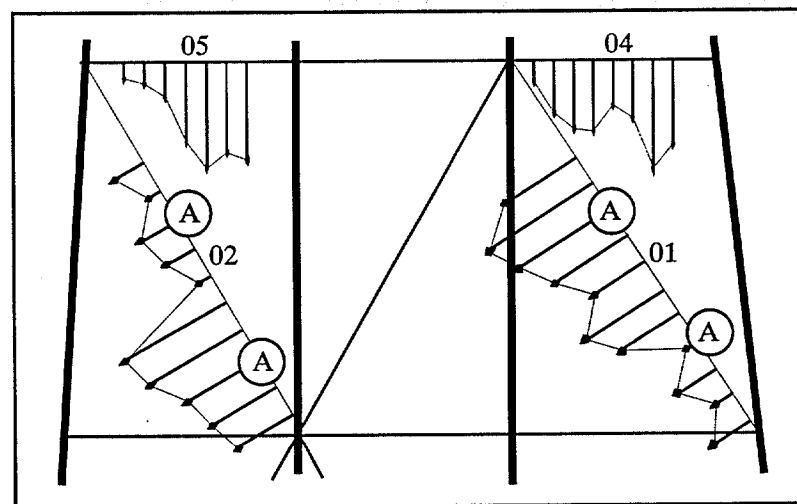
Wall Loss in Forest Structure (Schematic)
